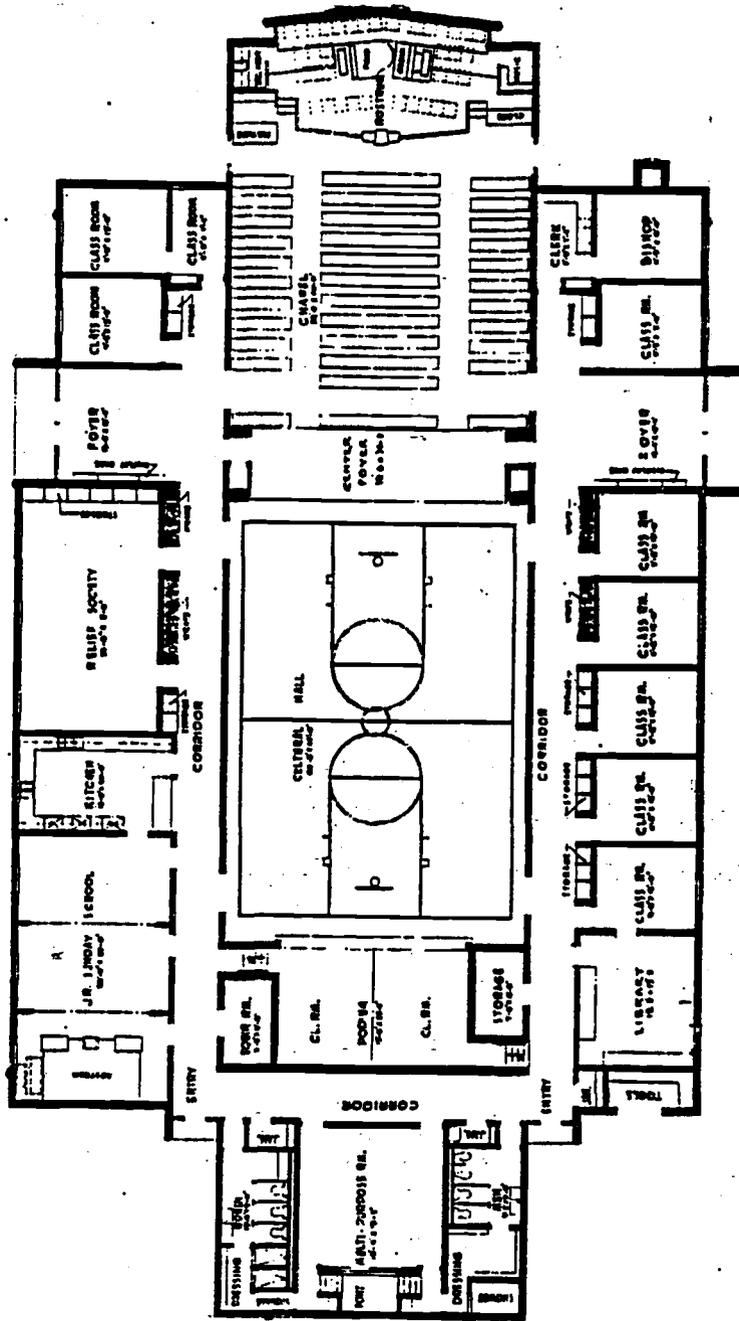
Floor plan of a typical single ward meetinghouse. LDS Church Architectural Services Division.
